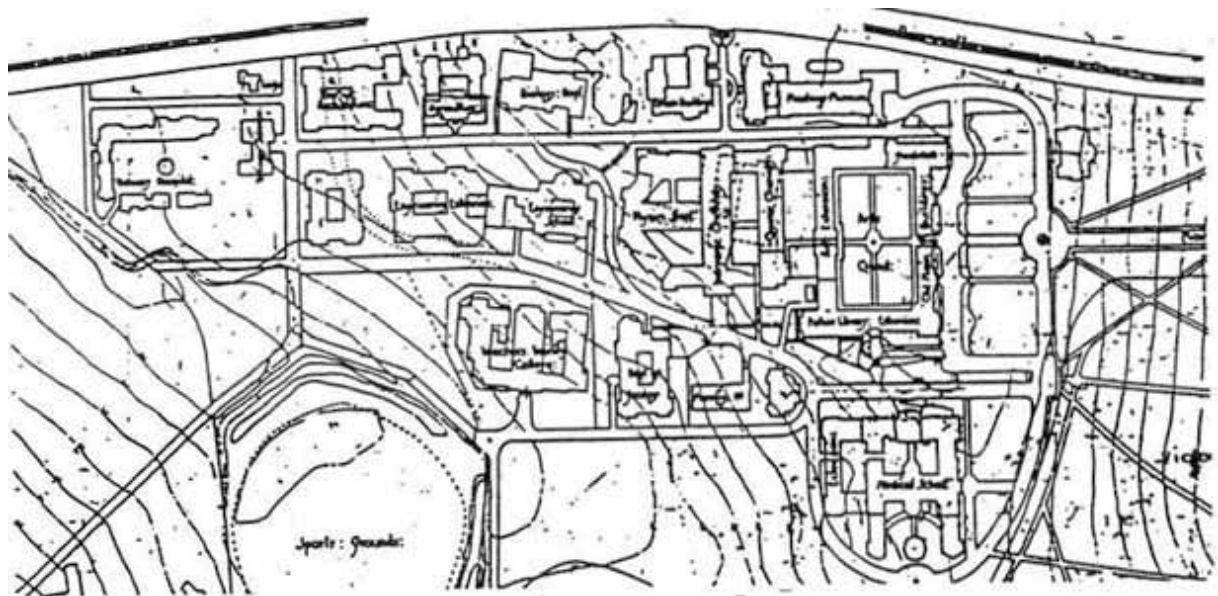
Plan by Government Architect in 1917 for extension to Quadrangle. Science Road appears on plan for first time extended to JD Stewart. (Source: Quadrangle CMP 2008)
